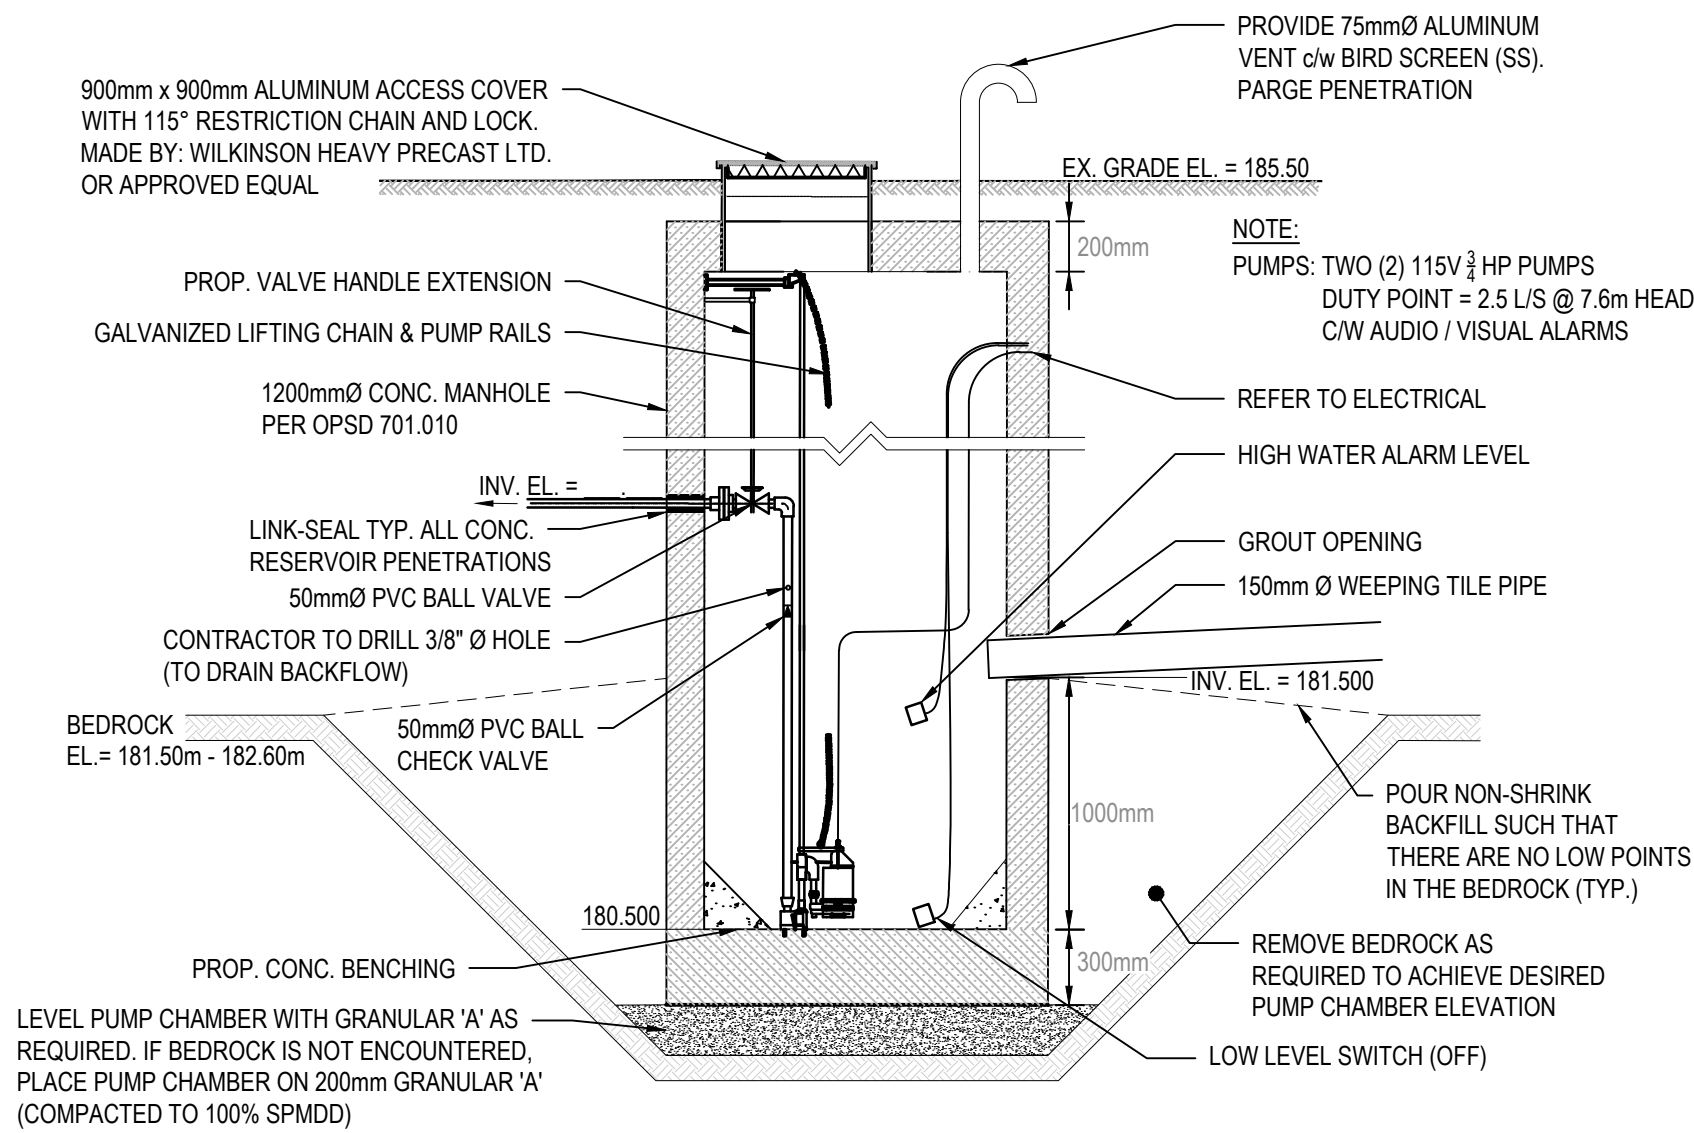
SANITARY PUMP CHAMBER DETAIL
